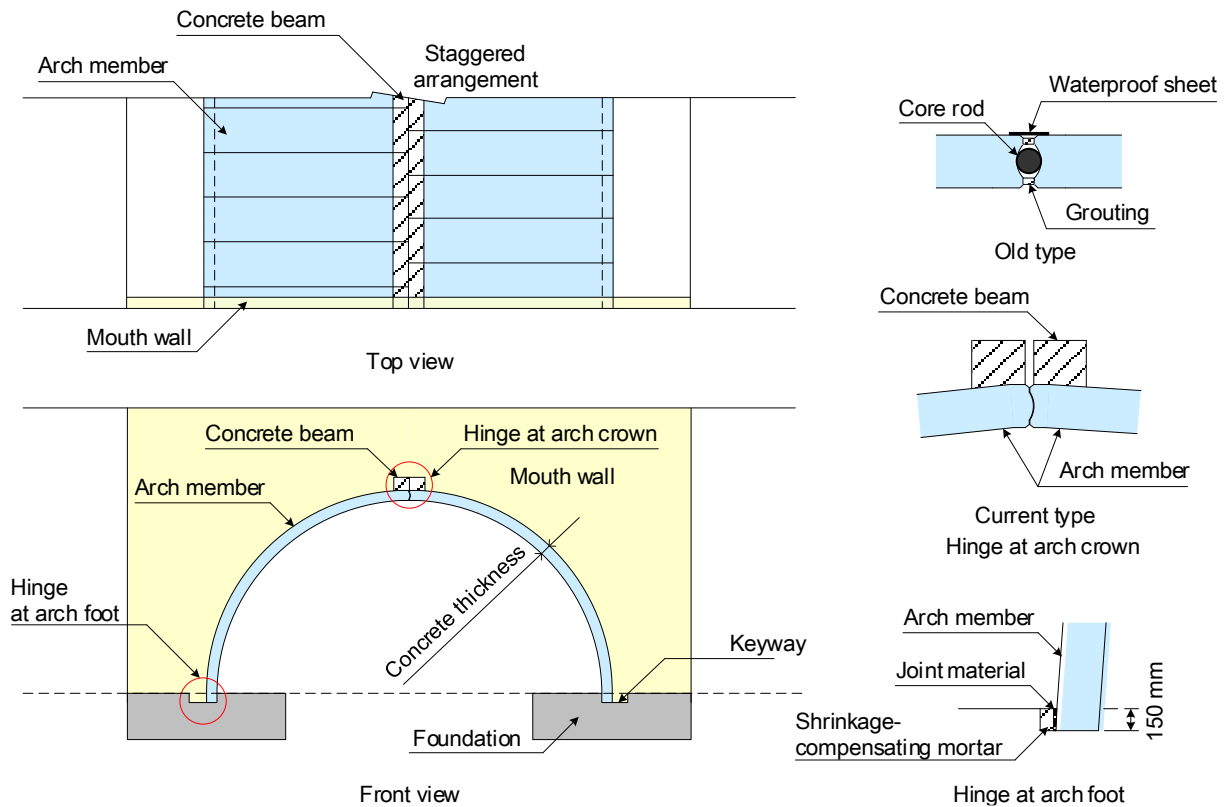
Schematic drawings of structural components of three-hinged type of precast arch culvert (based on drawing by Seto and Ootani, 2014).
